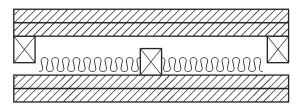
C7c: One row of 70 mm x 35 mm timber studs at not less than 600 mm centres
